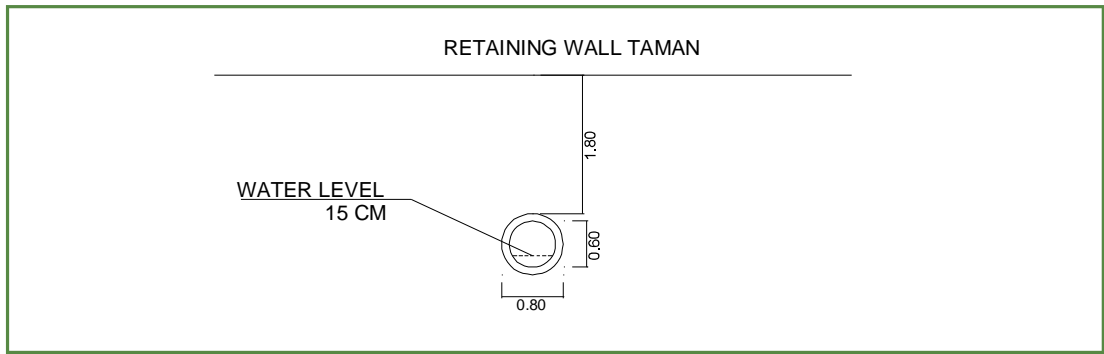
DETAIL OF CULVERT-5 (TAMBORA AREA-1)
